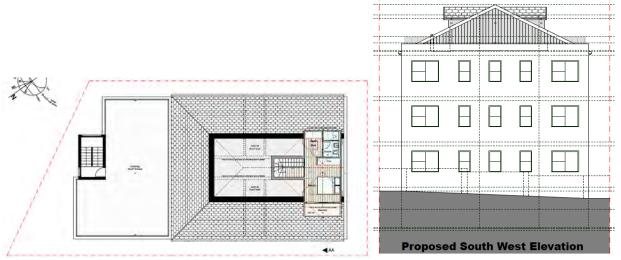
Plans of refused proposal under DA-107/2019. (Source: iSA Designs, 2019)
